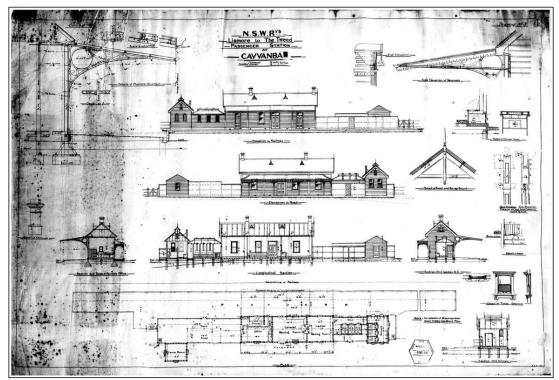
Original plans of Cavvanba (Byron Bay) Railway Station. ARHSnsw
